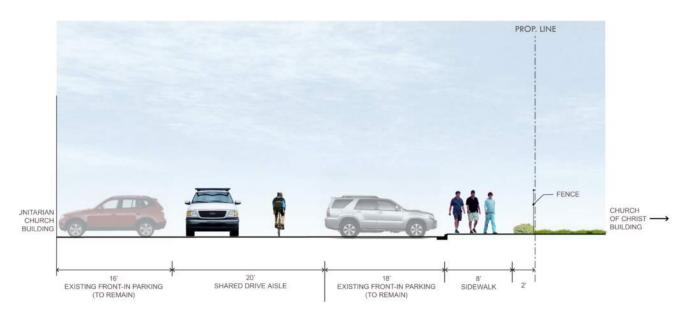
Option 1 – Minimal Build-Out Typical Section
